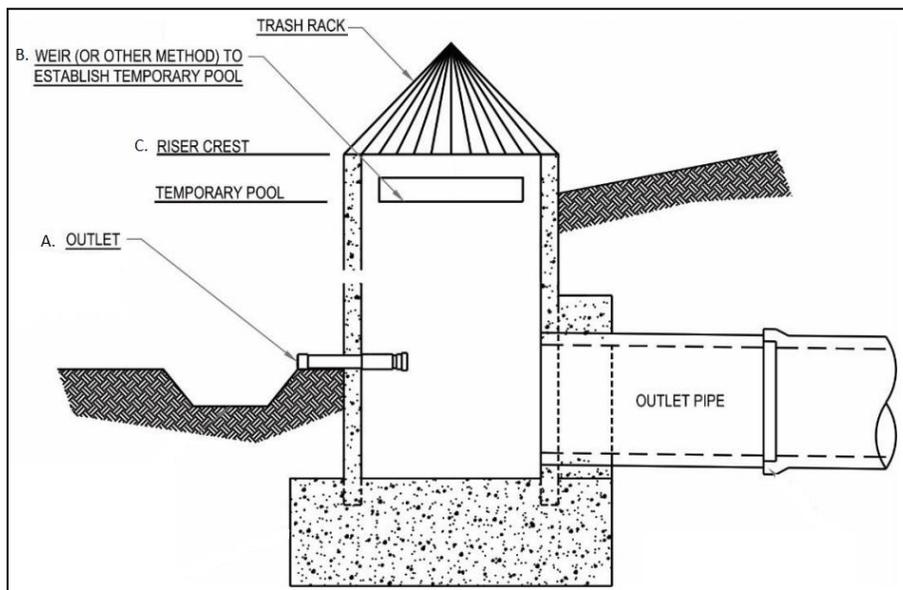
Dry pond outlet structure modified from NC Stormwater Design Manual (NCDEQ, 2017c).
